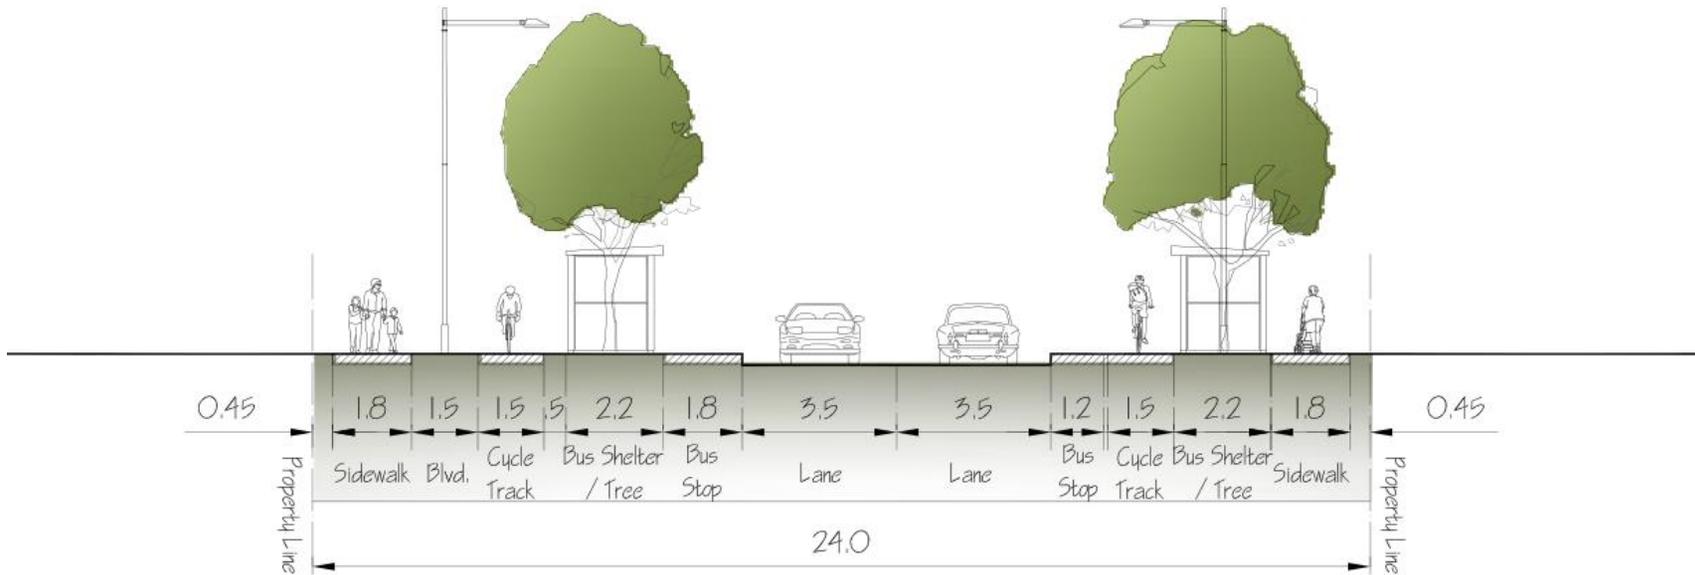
Collector Street Cross Section at Transit Stop (24.0m)
